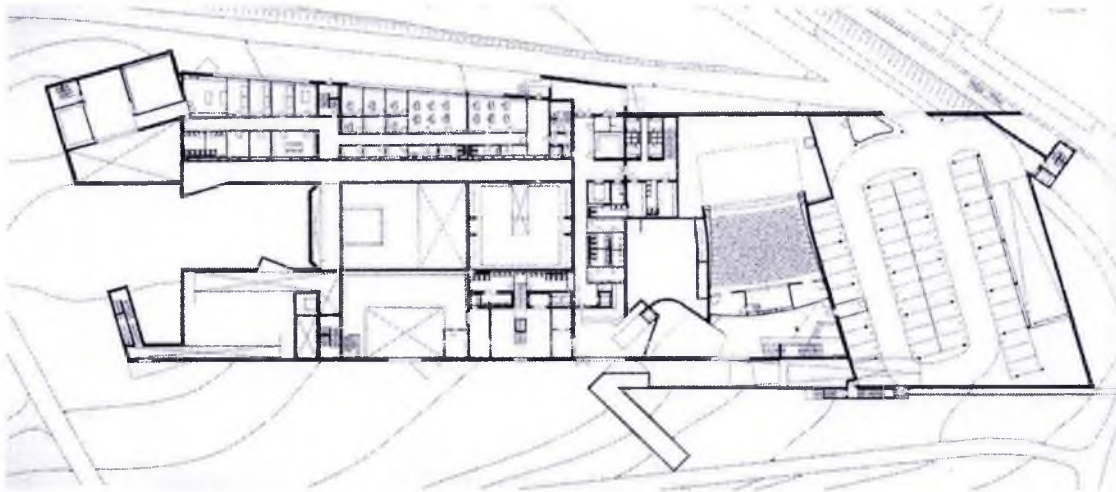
Ground floor plan showing exhibition galleries and related storage spaces.
